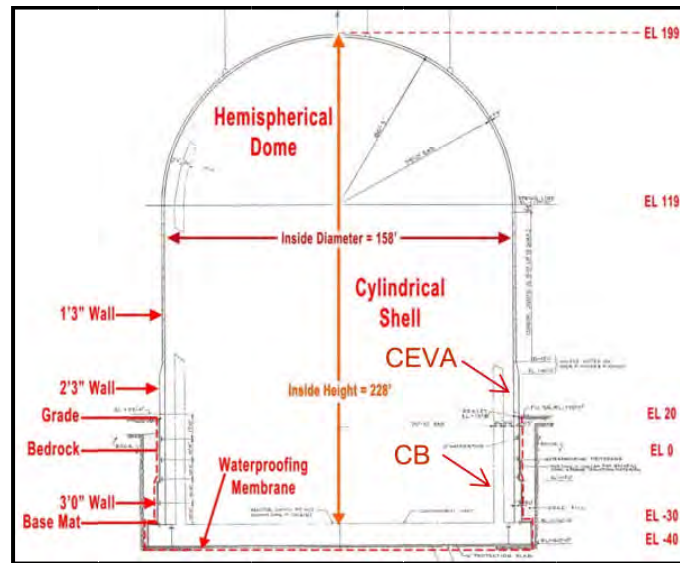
Seabrook Station Containment Enclosure Building - Cross-Section
